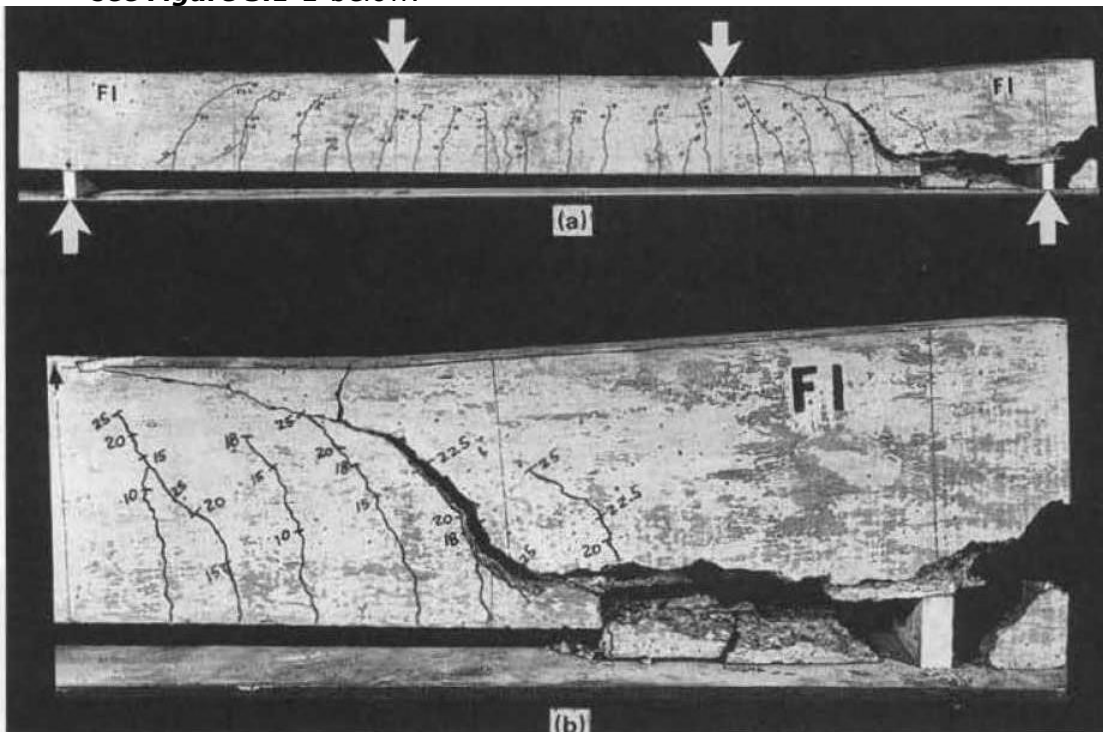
Shear failure of reinforced concrete beam: (a) overall view, (b) detail near right support.
